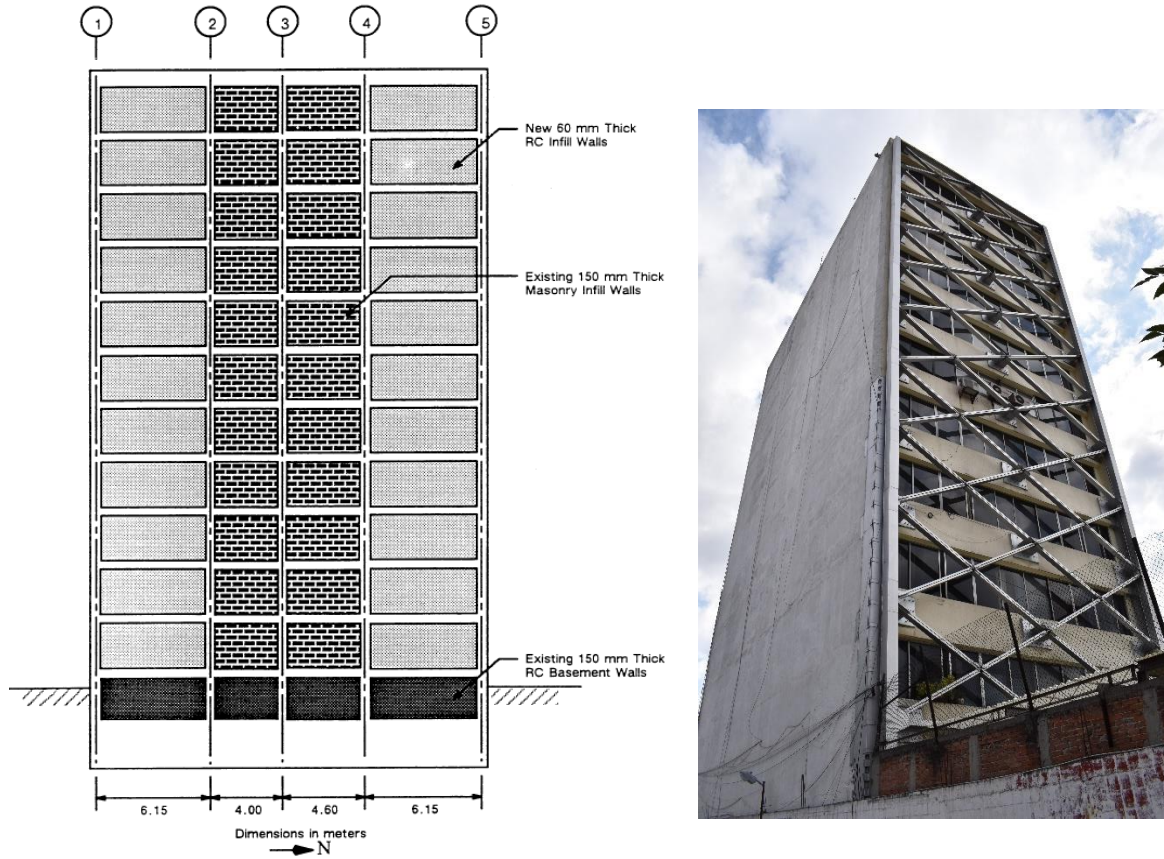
Elevation of Frame C showing new RC infill walls (Downs, et al., 1991) alongside a photo of the southeast corner of the building
